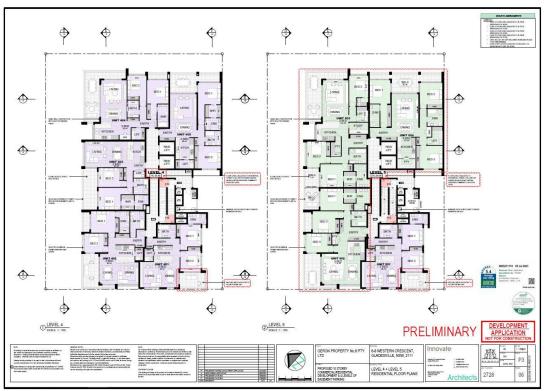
Proposed Level 4 + Level 5 Residential Floor Plans
